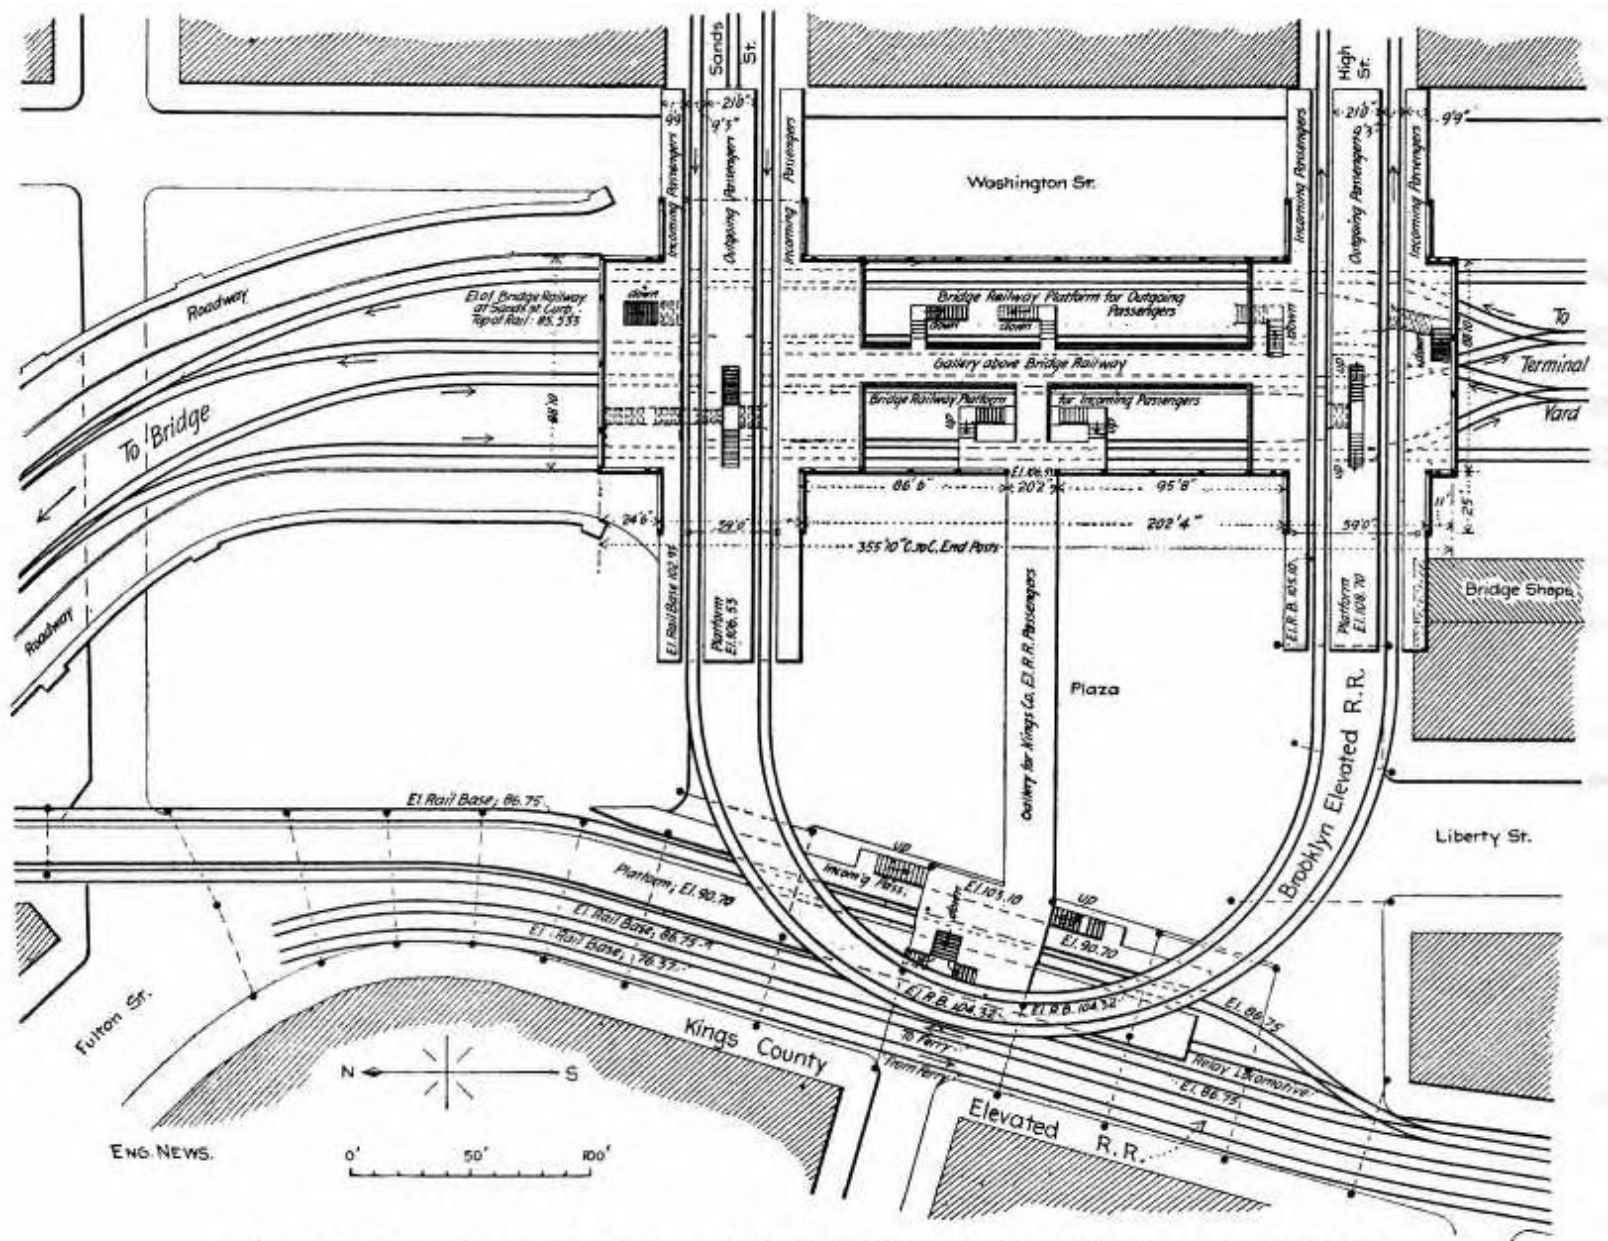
PLAN OF BRIDGE AND ELEVATED RAILWAY TERMINALS.
